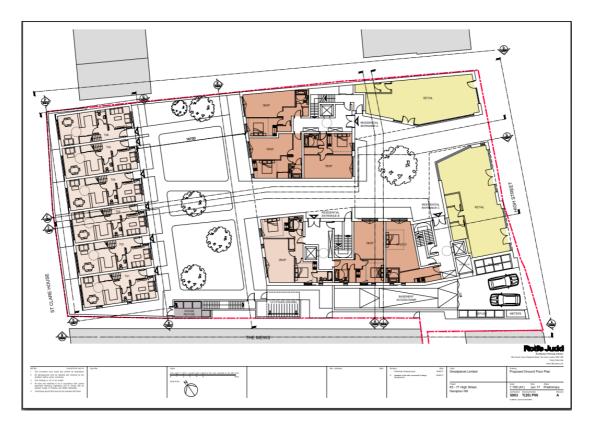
Indicative site layout and landscape plan (not to scale)(copyright: Rolfe Judd).
